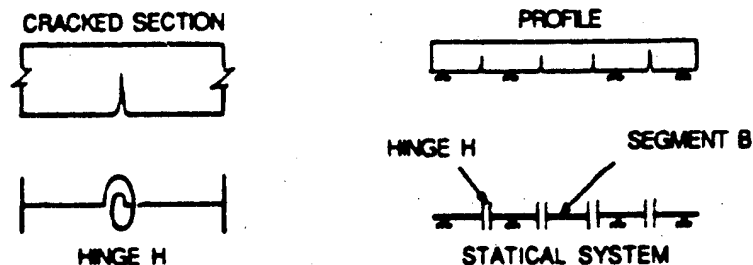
Modelling assumptions of cracked sections of a bridge.
